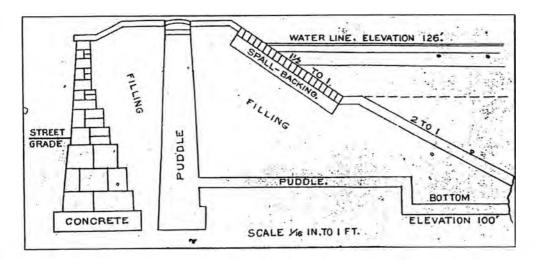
Section of reservoir wall ("Plan of Jersey City Reservoir," Engineering News, November 27, 1880).46
